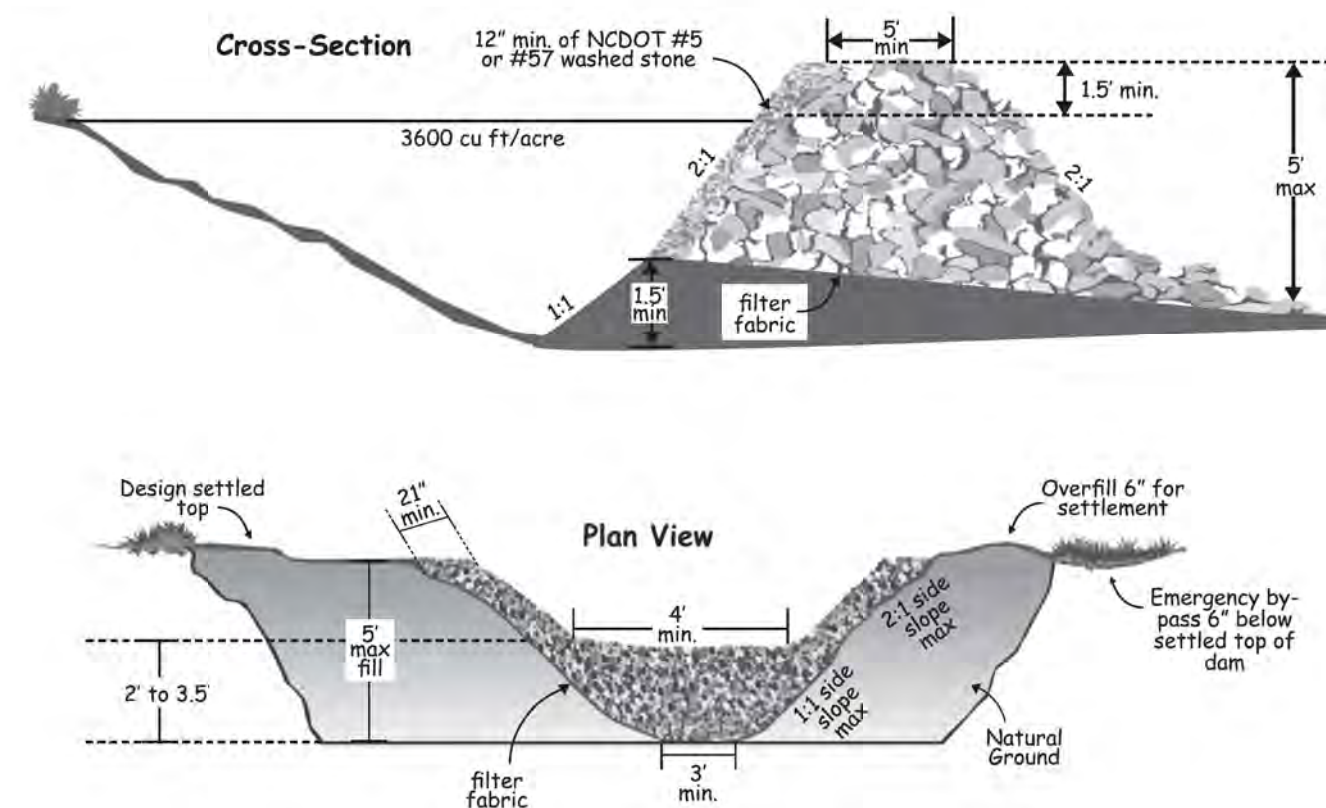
Plan view and cross-section view of a temporary sediment trap.
